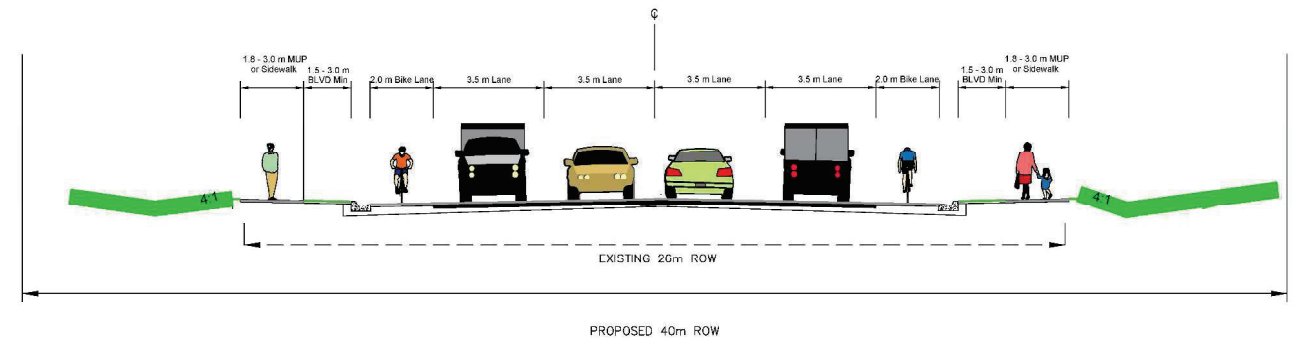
Section 2 Alternative 6 - 4-Lane Urban Cross Section
